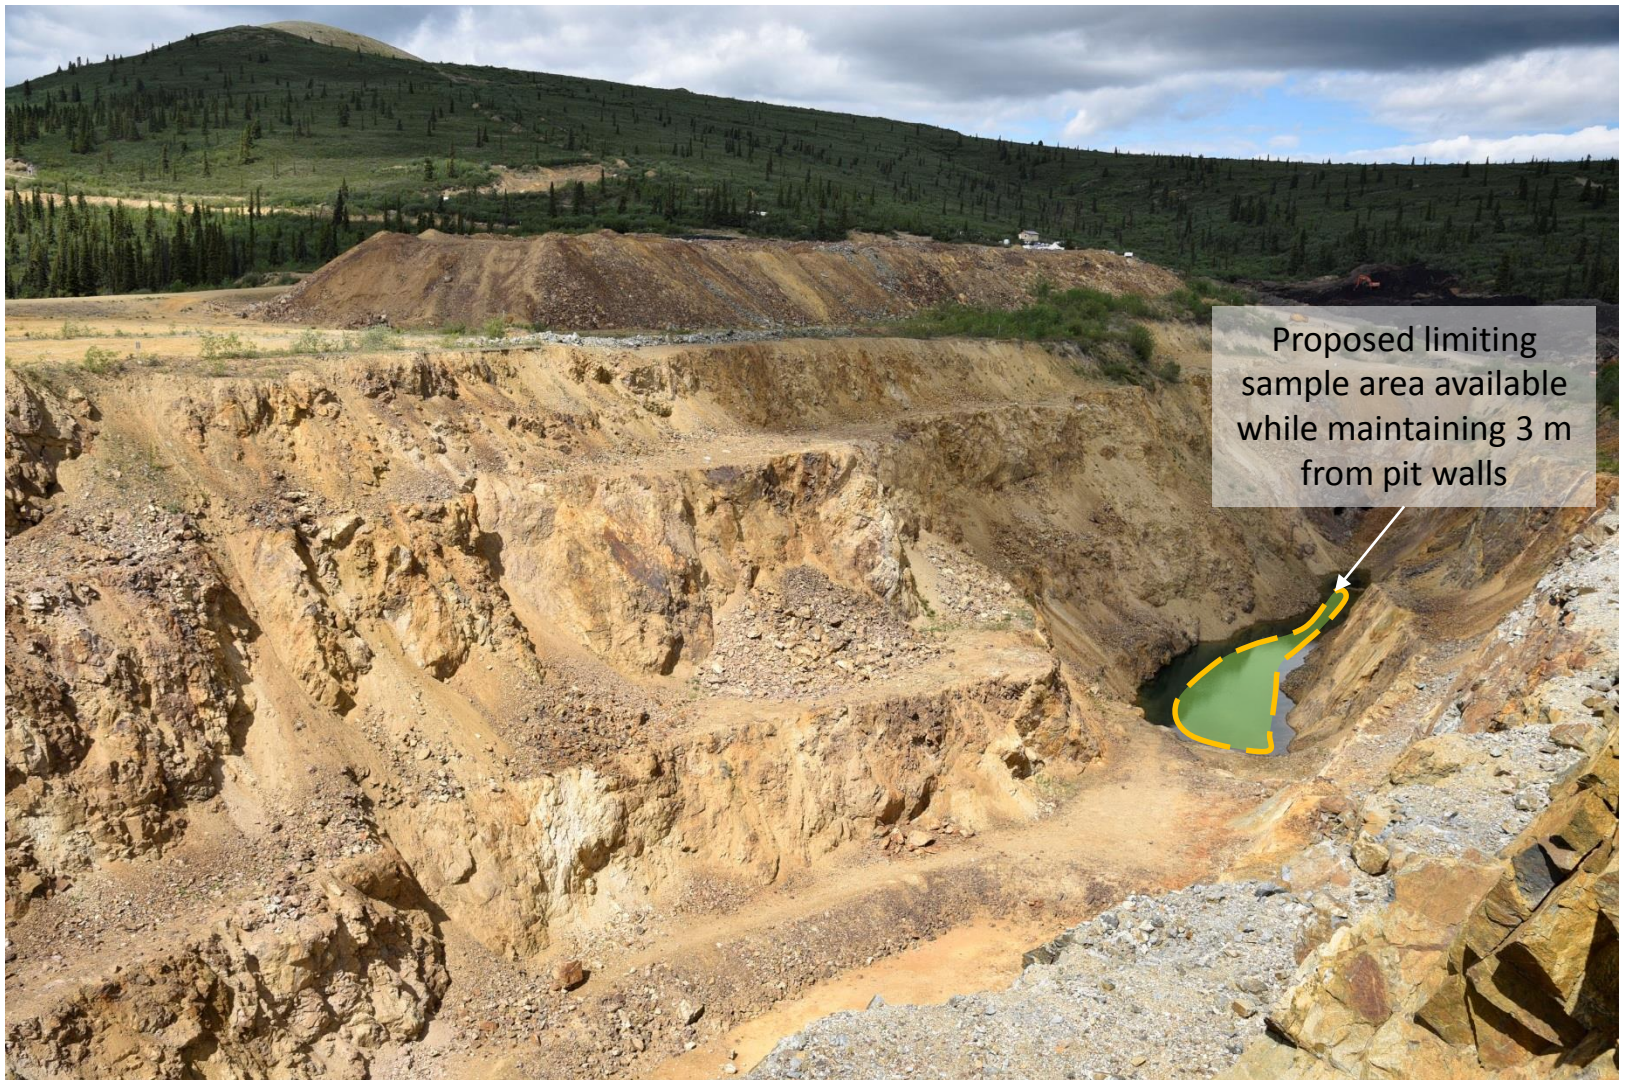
Maintain 3 m from pit walls while undertaking profile sampling within the pit lake. Photo taken June 23, 2016
